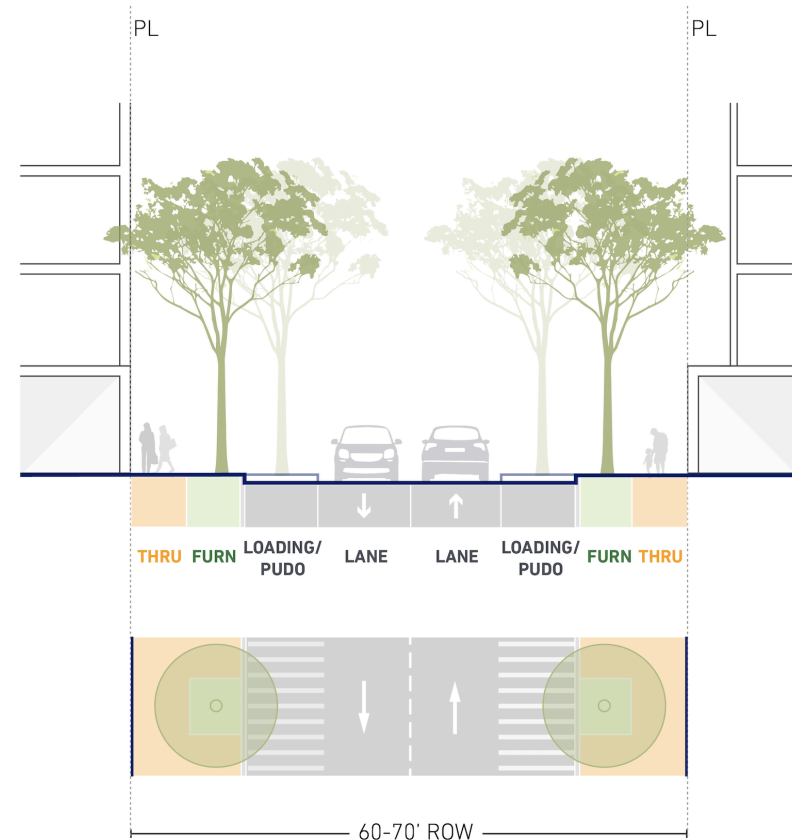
Conceptual typical street section for proposed new streets within the Station Block
